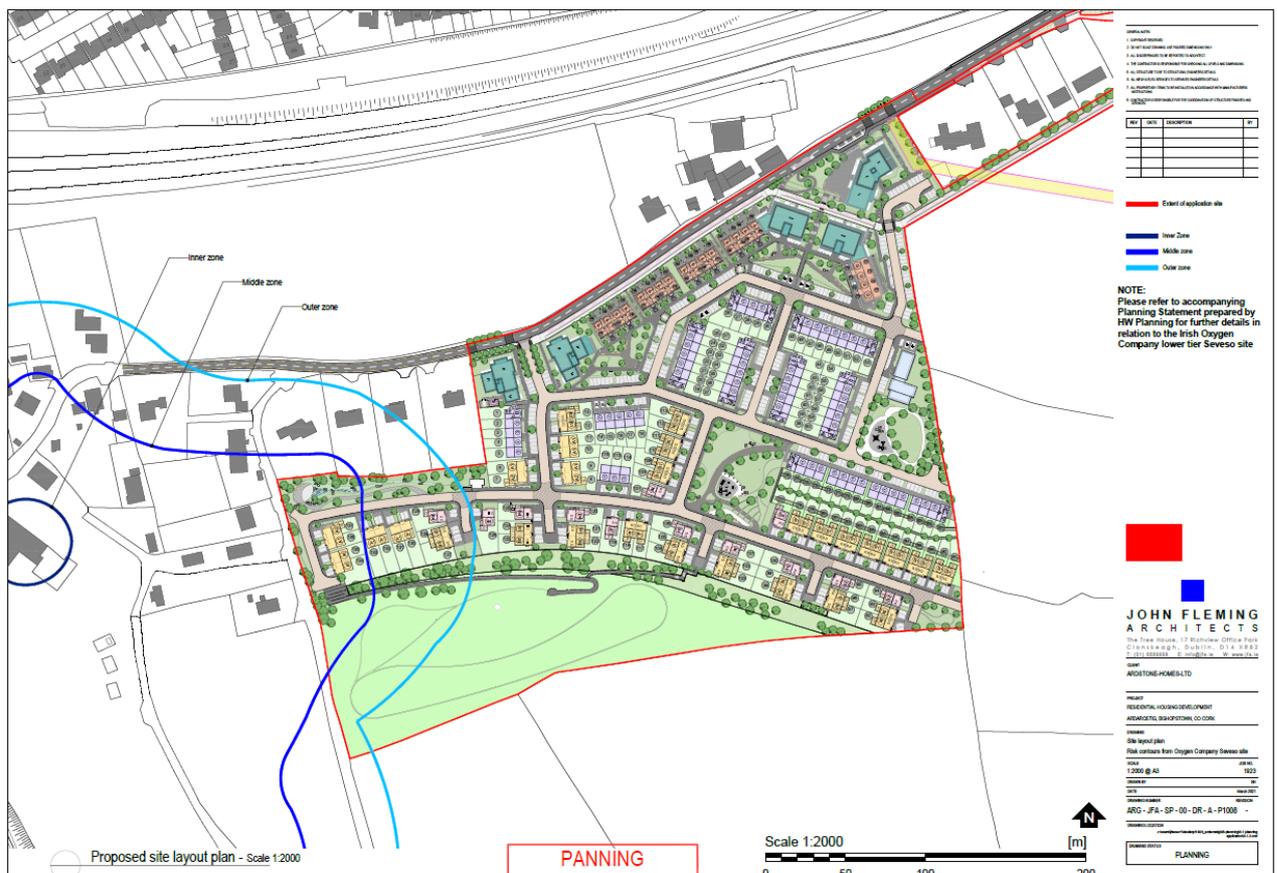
Site Layout Plan with middle and outer risk zones overlaid.
